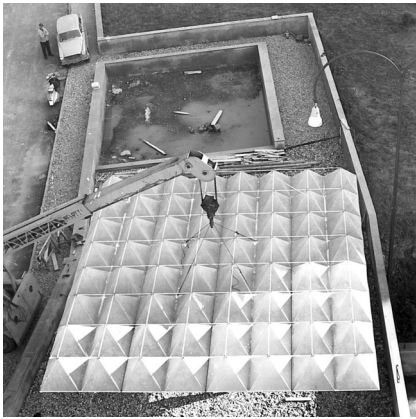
, 4. Reinforced polyester space frame, Genoa, 1965. Renzo Piano. (Fondazione Renzo Piano)
